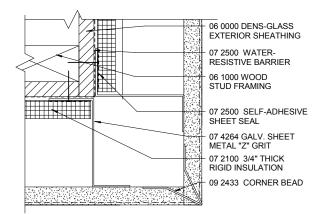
DETAILS CASE NO. 14-117884 DZM EXIBIT B39
